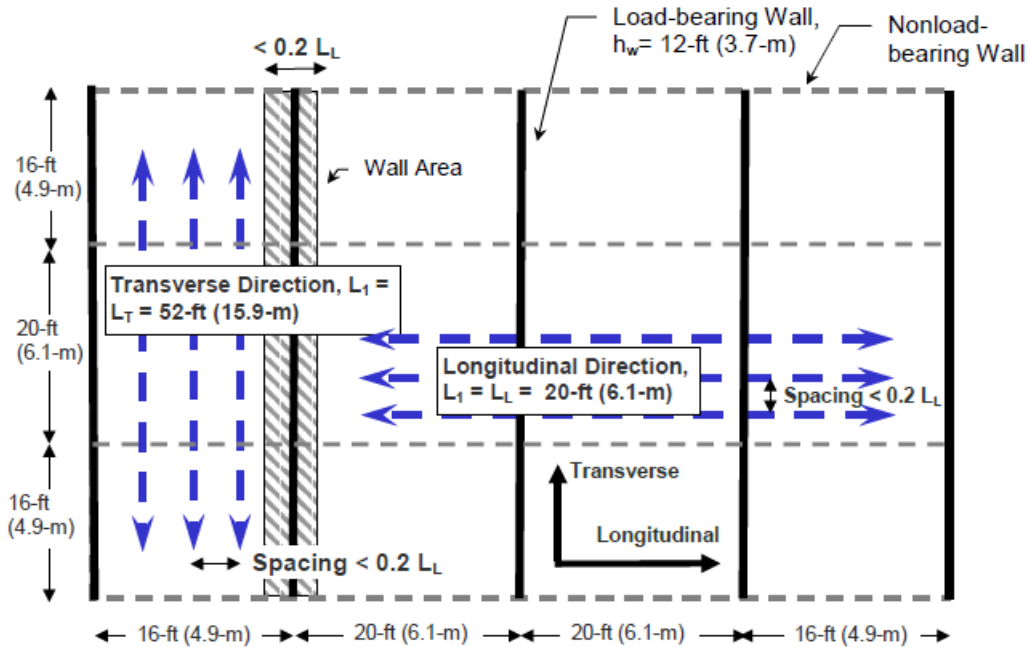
Determination of L_1 for one-way load-bearing wall construction (DoD, 2013)
